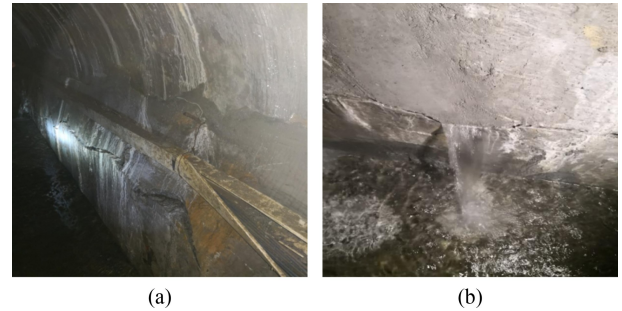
Deformation and cracking of corridor. (a) Deformation of corridor; (b) cracks and seepage at the downstream wall.
